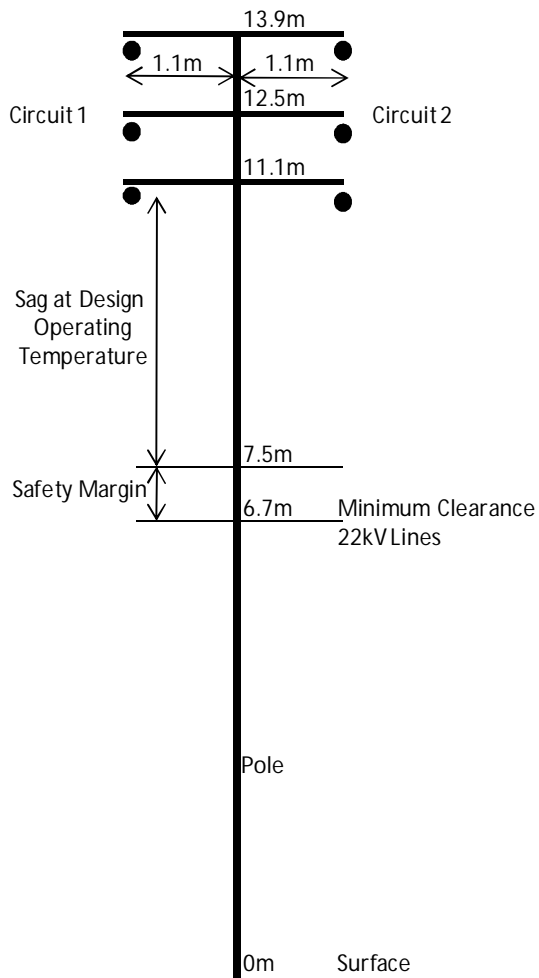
Sketch of a transmission line pole similar to the one proposed
